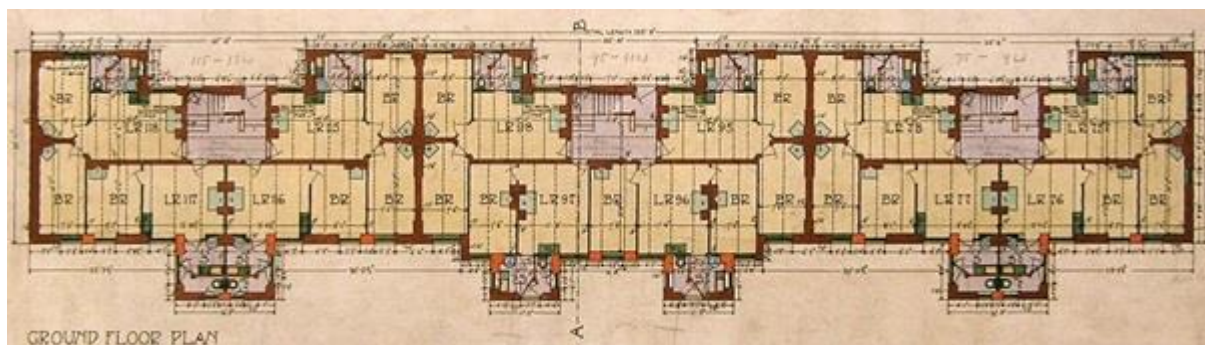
Ground floor plan of smaller Chadworth Building (LCC/AR/HS/03/014)
